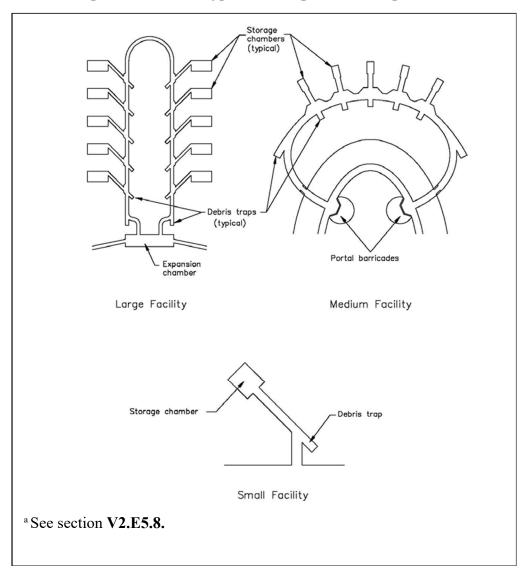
E5.F4. Typical Underground Storage Facilities^a
